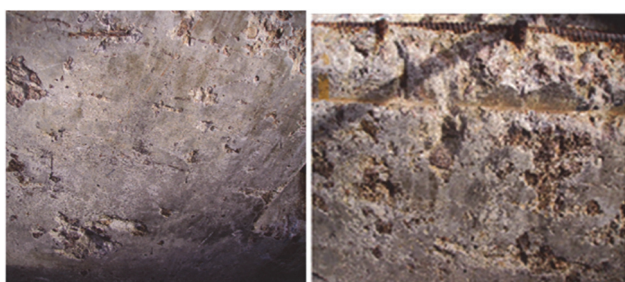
Damages in concrete surface of a hydraulic structure.
